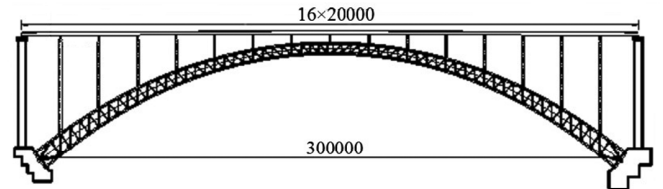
Cross section of the Xianghuoyan Bridge (unit: mm).
